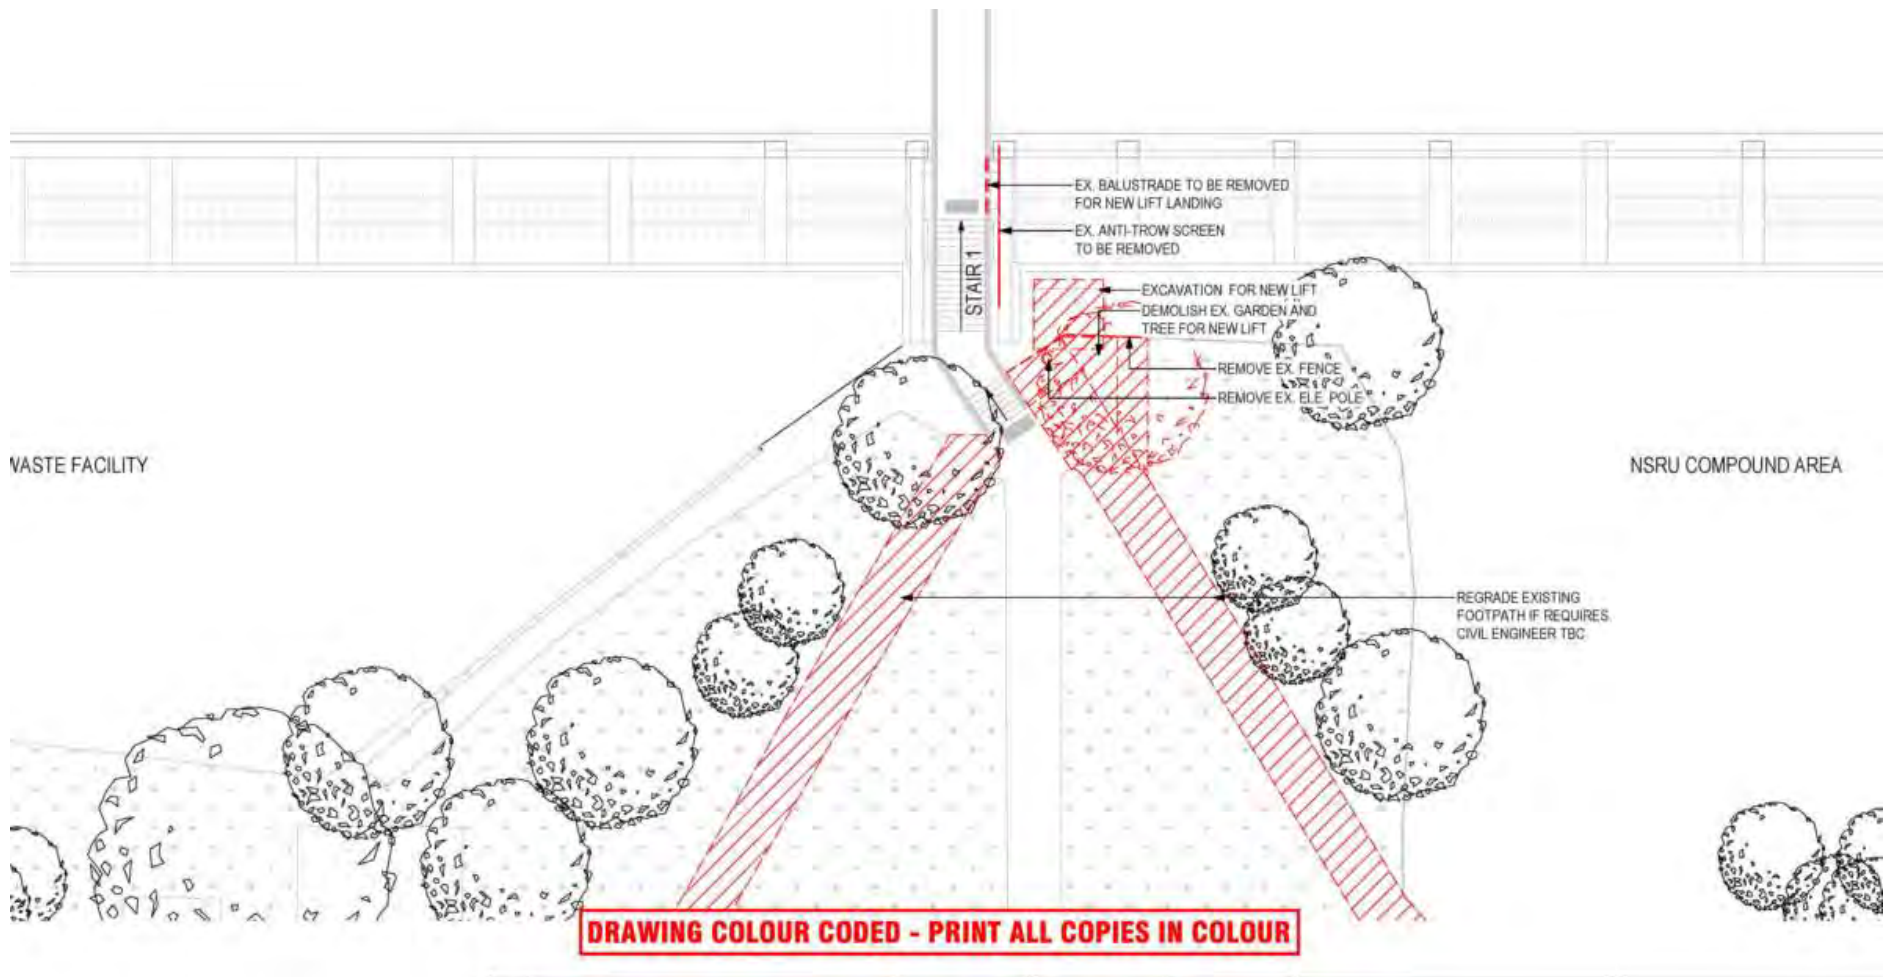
Plan indicating scope of demolition and excavation works around the Queen St entrance to the Station (red shading). (Source: Transport for NSW)
